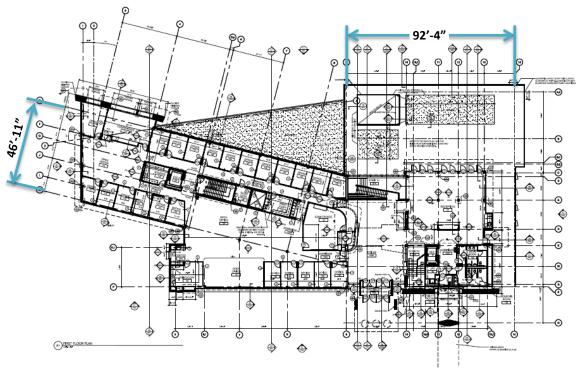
Typical Floor Plan (Level 1) Drawing A101
